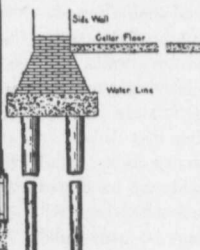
The familiar wooden pile foundation, with combination of spread footing and steel grillage.
